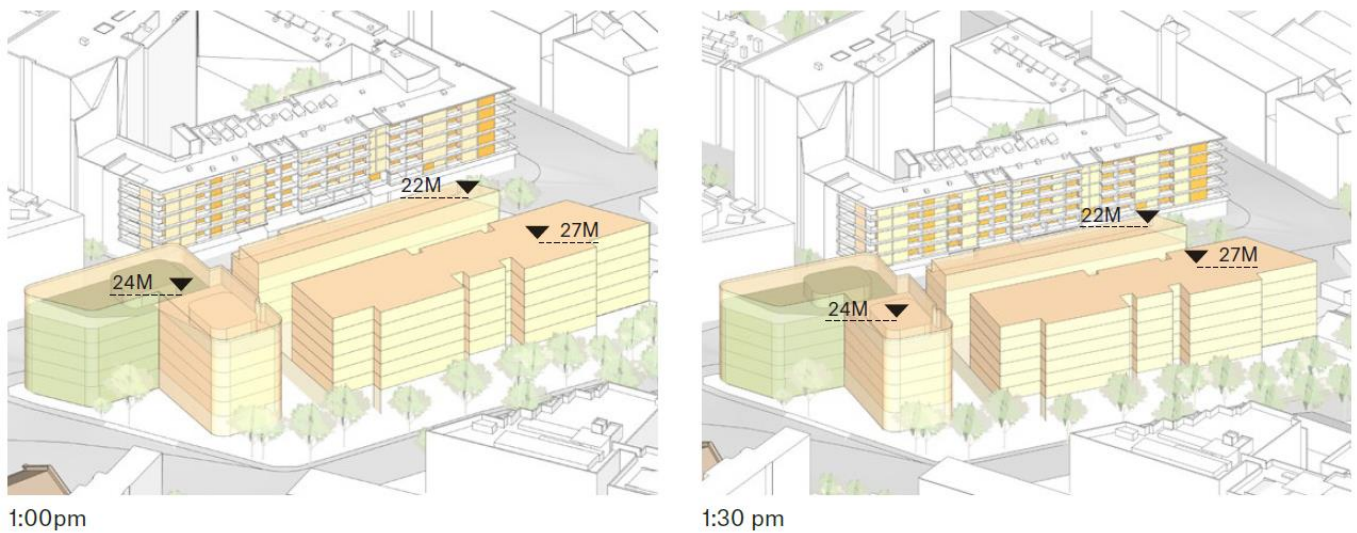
Extract of daylight access modelling of envelope heights on adjacent 840 Bourke St dwellings
